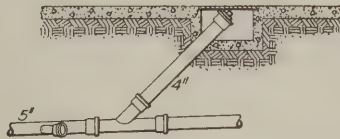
Method of Fitting Clean-outs in Drains Under Floor
